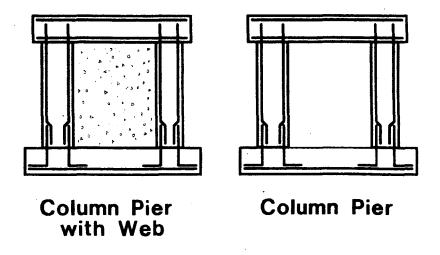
Primary Reinforcing Steel in Column Pier With Web and in Column Pier
